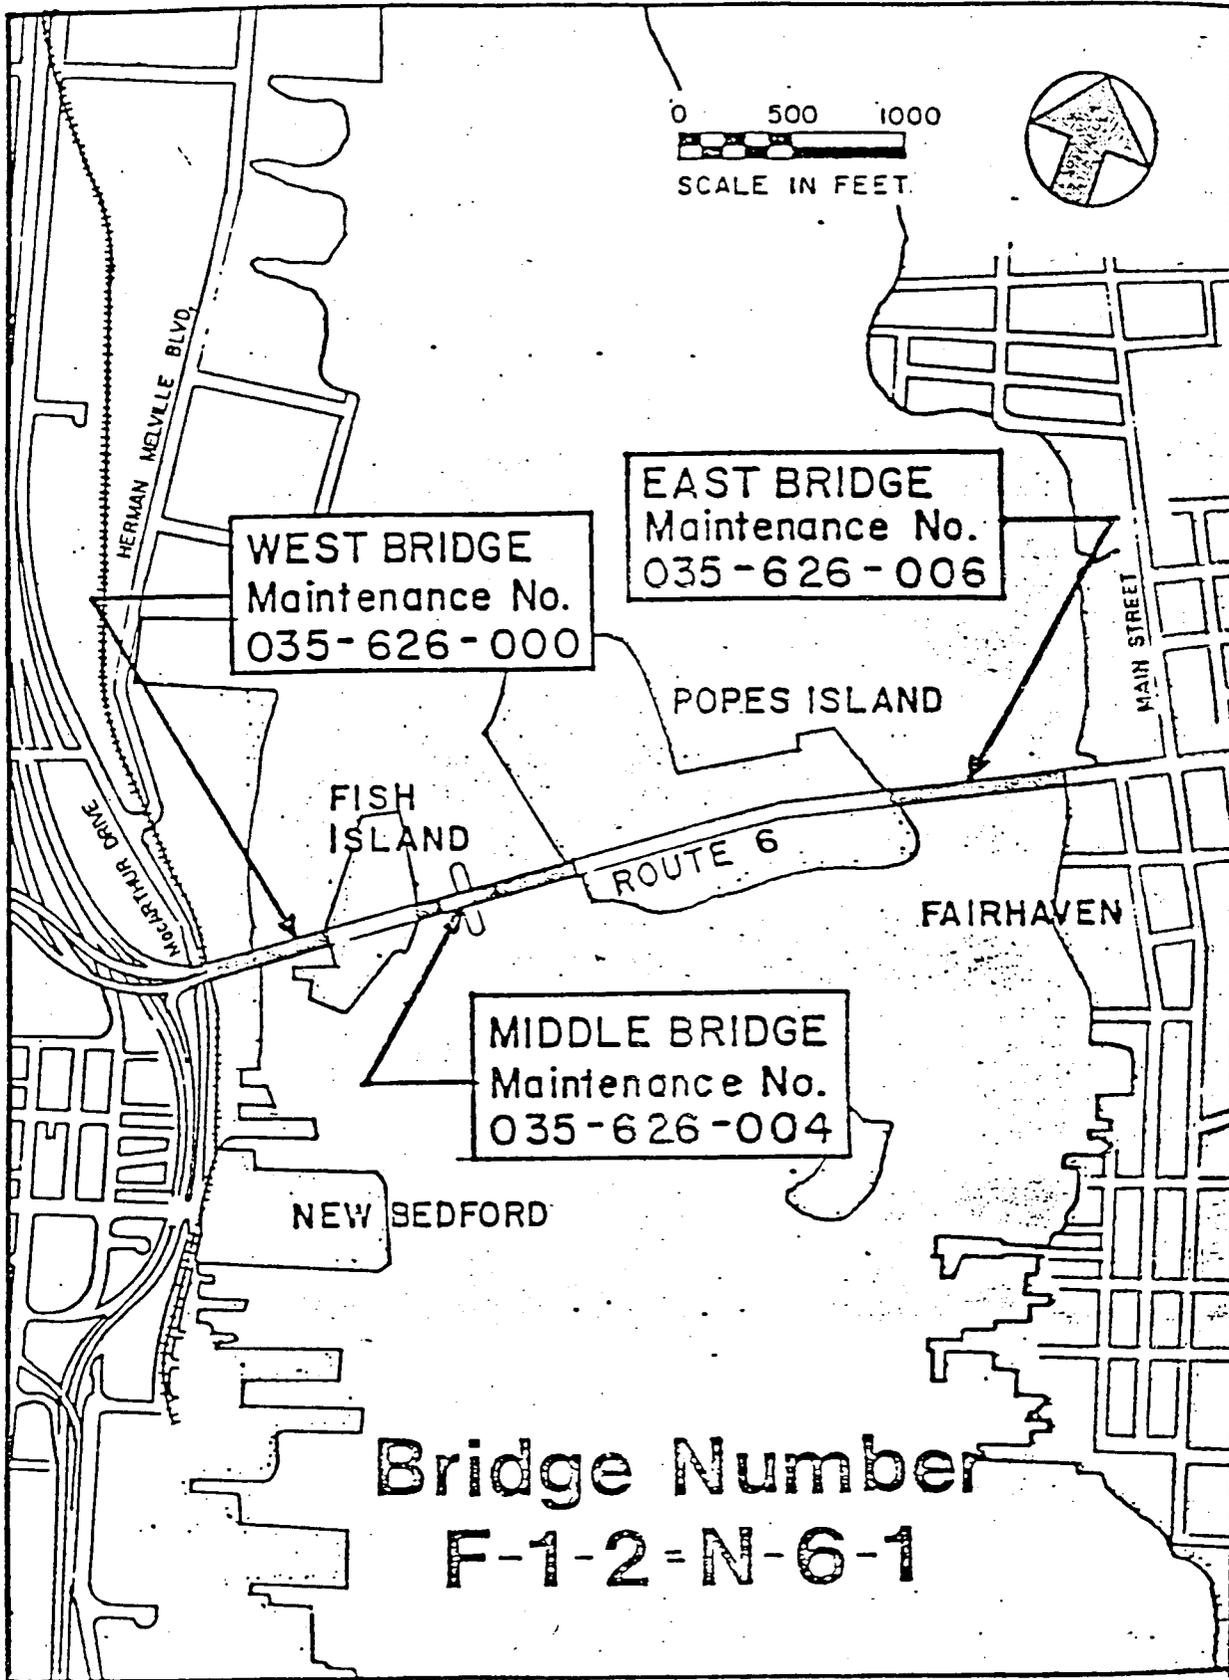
Plan of New Bedford-Fairhaven Bridge.
